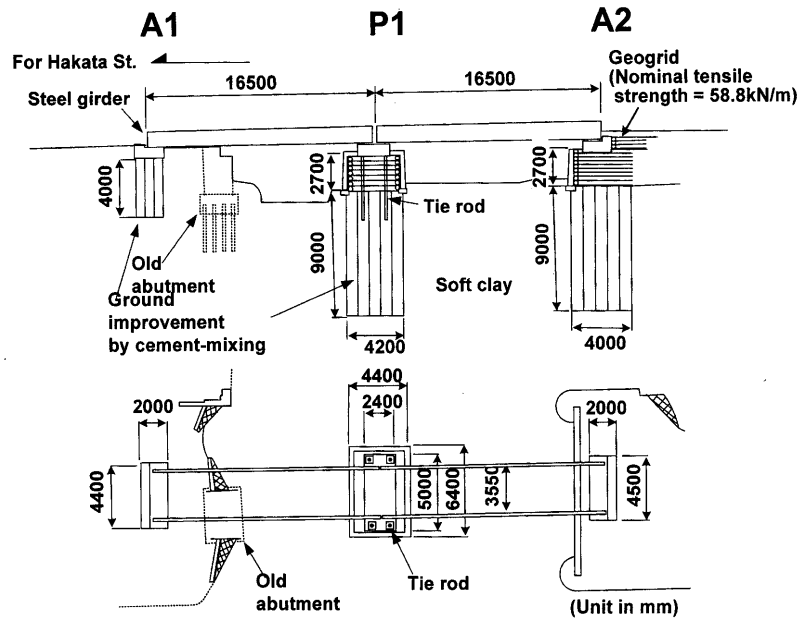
Maidashi bridge with PLPS reinforced soil pier
